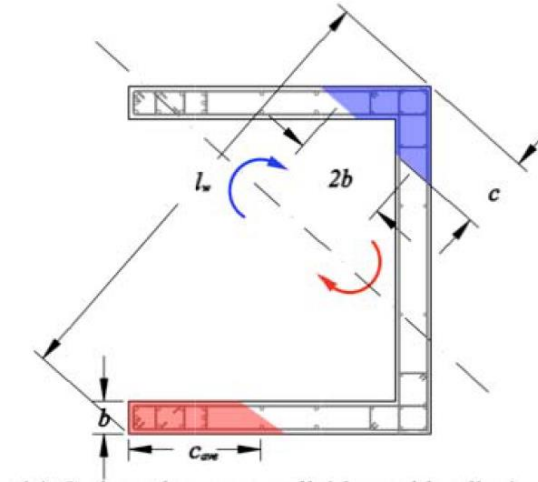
Plan view of a C-shaped wall with bi-directional loading
